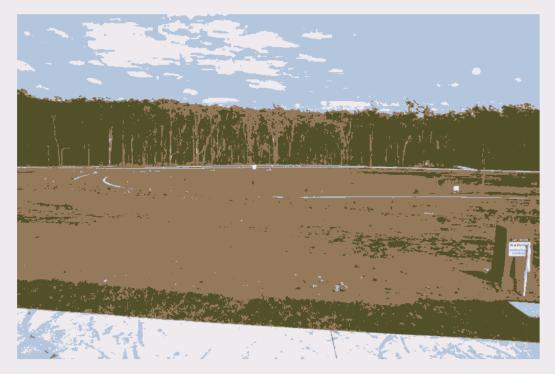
Looking south-west across the site towards Lonhro Way and Phar Lap Circuit.
